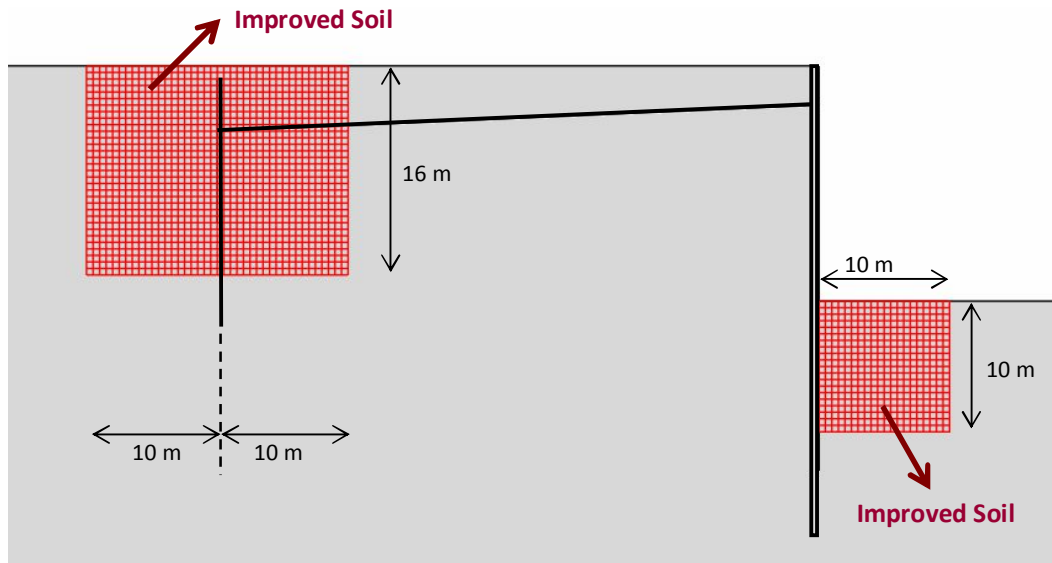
Location and geometry of the soil improvement regions in case of a 36 m main wall and an 18 m anchor wall.
